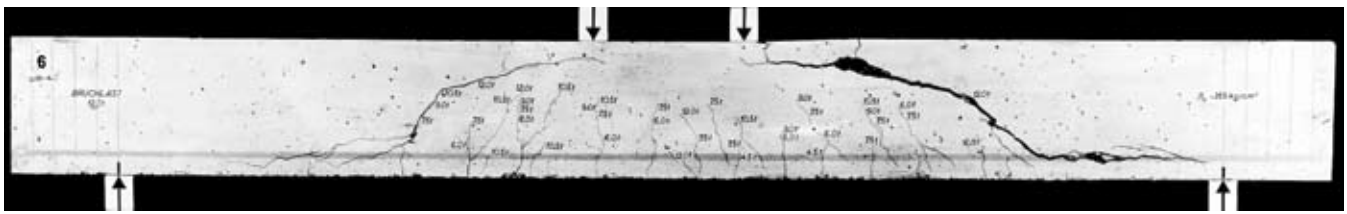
Foto of beam 6 without stirrups after failure (Leonhardt and Walther (1962))
